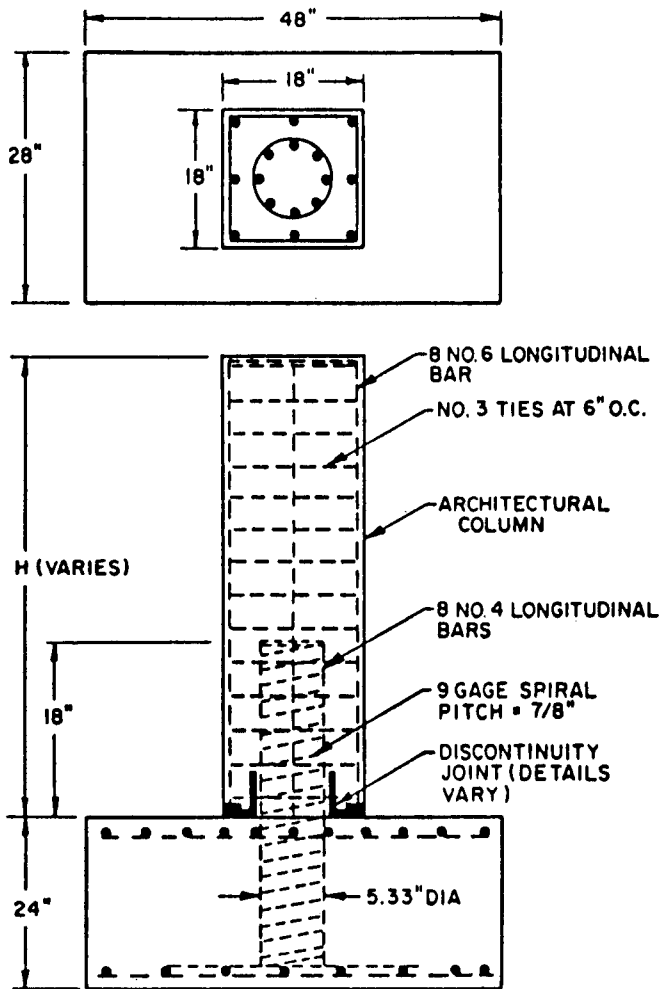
Typical dimensions and reinforcement of the column specimens.
